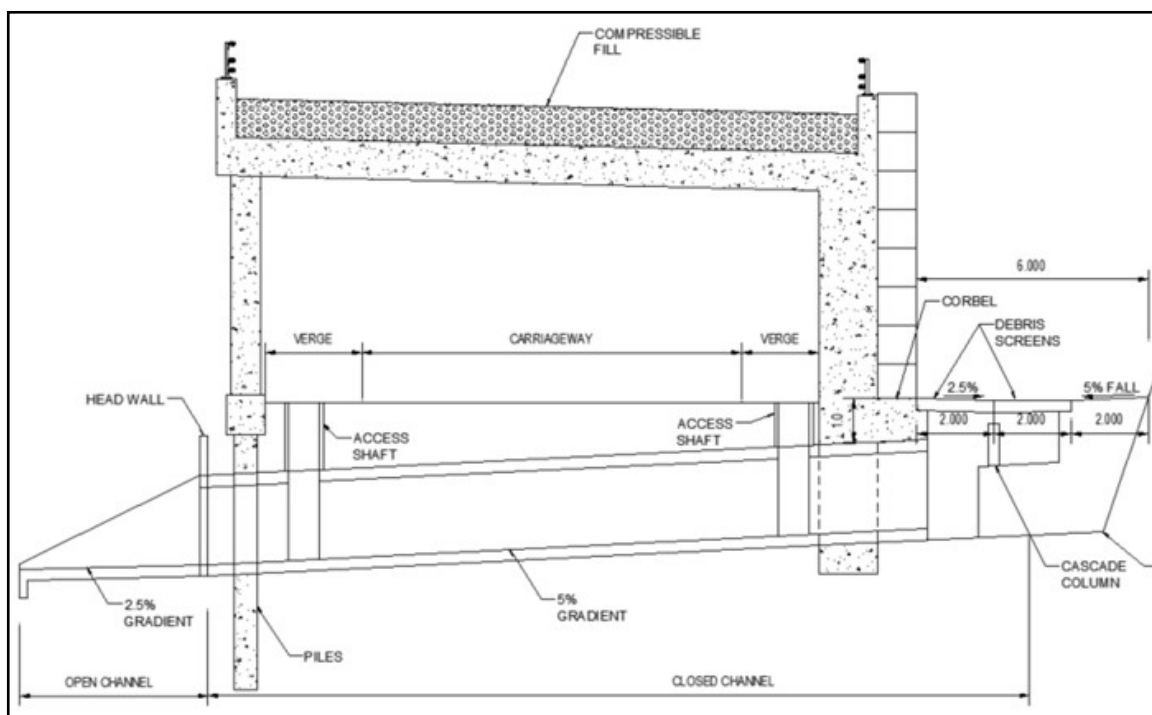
3 – Sections of the proposed culvert crossing under the A83.
